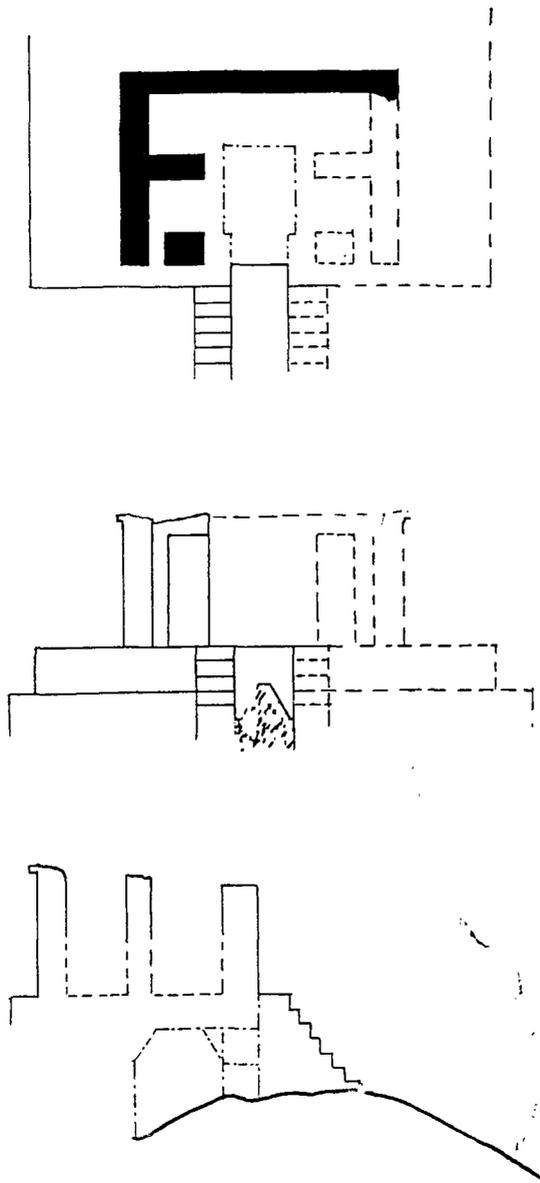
Comalcalco, Tab. Ground plan and section of Temple 1. Scale 1:200.
